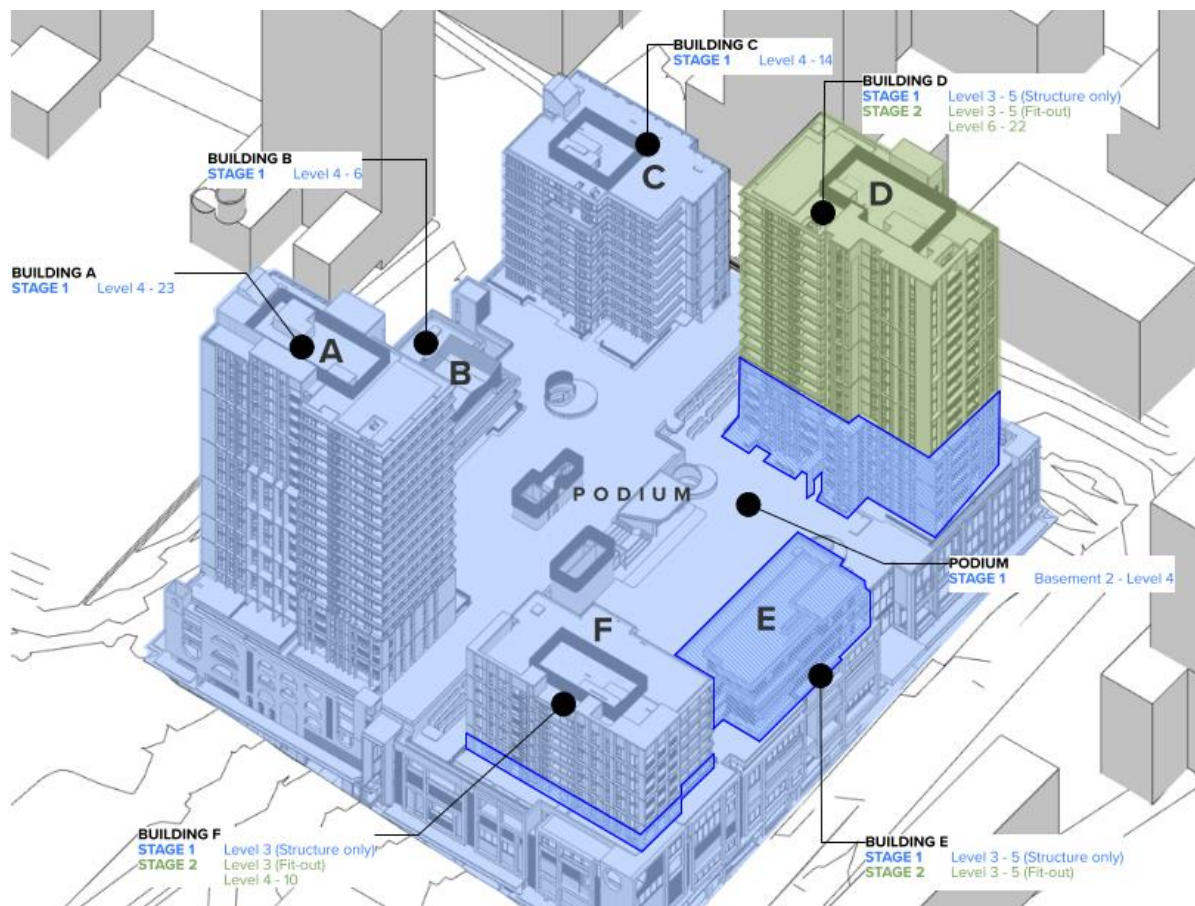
Proposed Building References and Staging Plan. (Building A in north-west corner of the site, and letters alphabetically clockwise)
